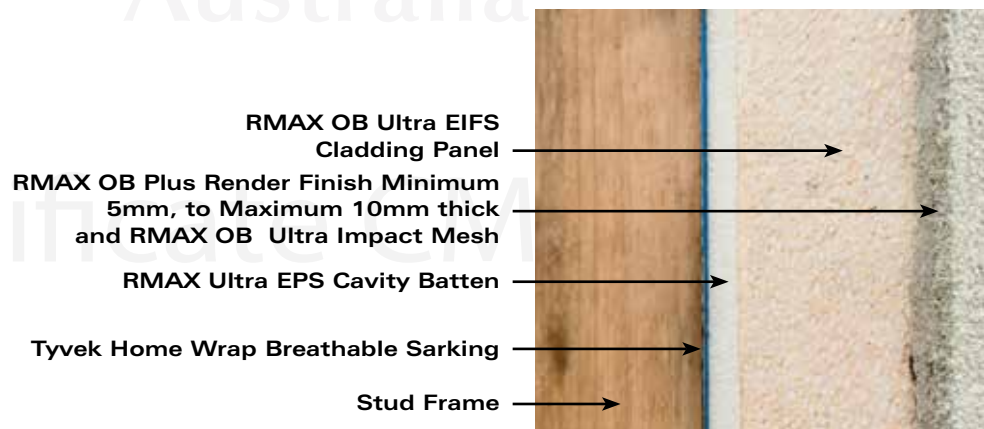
Cross section of complete RMAX OB Ultra Ground Floor EIFS System.
